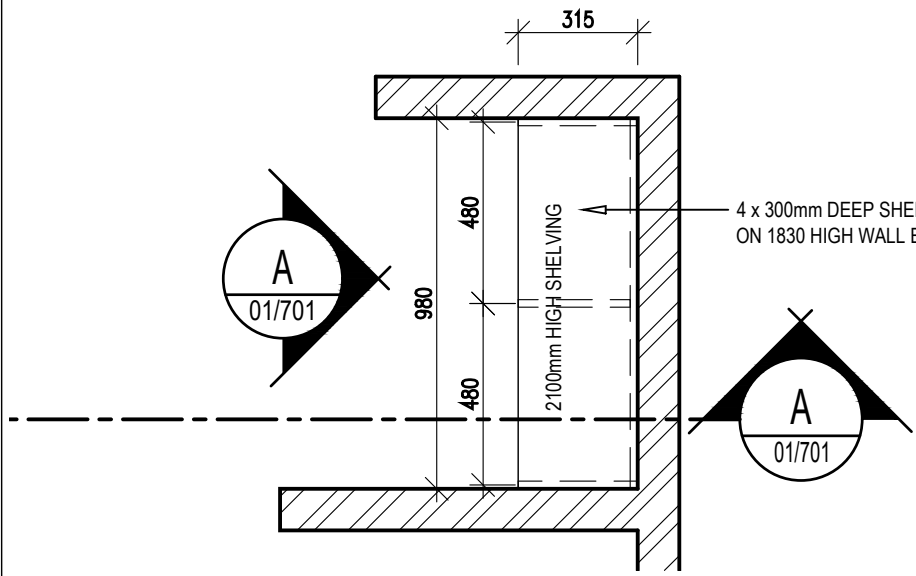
ENTRANCE FOYER DB CUPBOARD SHELIVING- ELEVATION A
